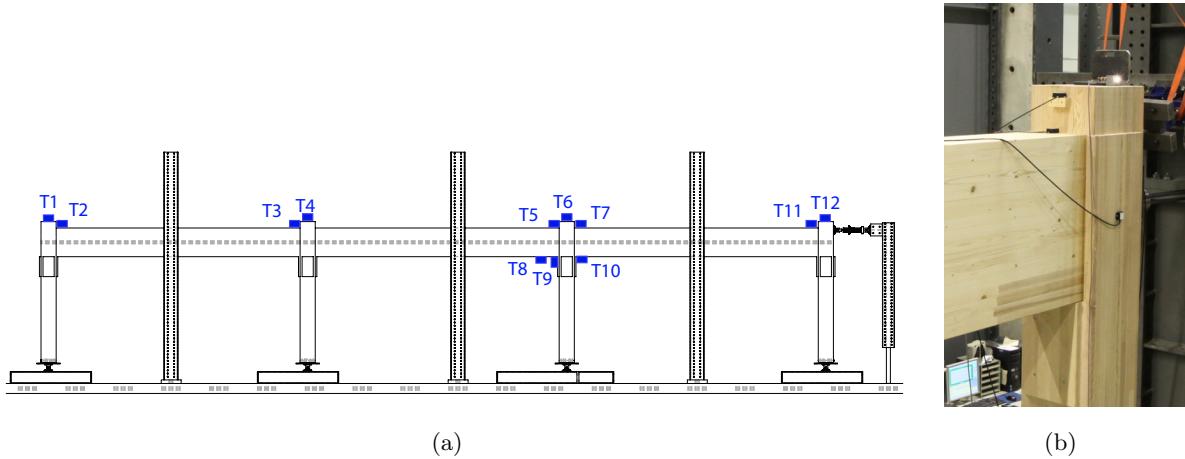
Inclinometers attached to the column and the adjacent beam
